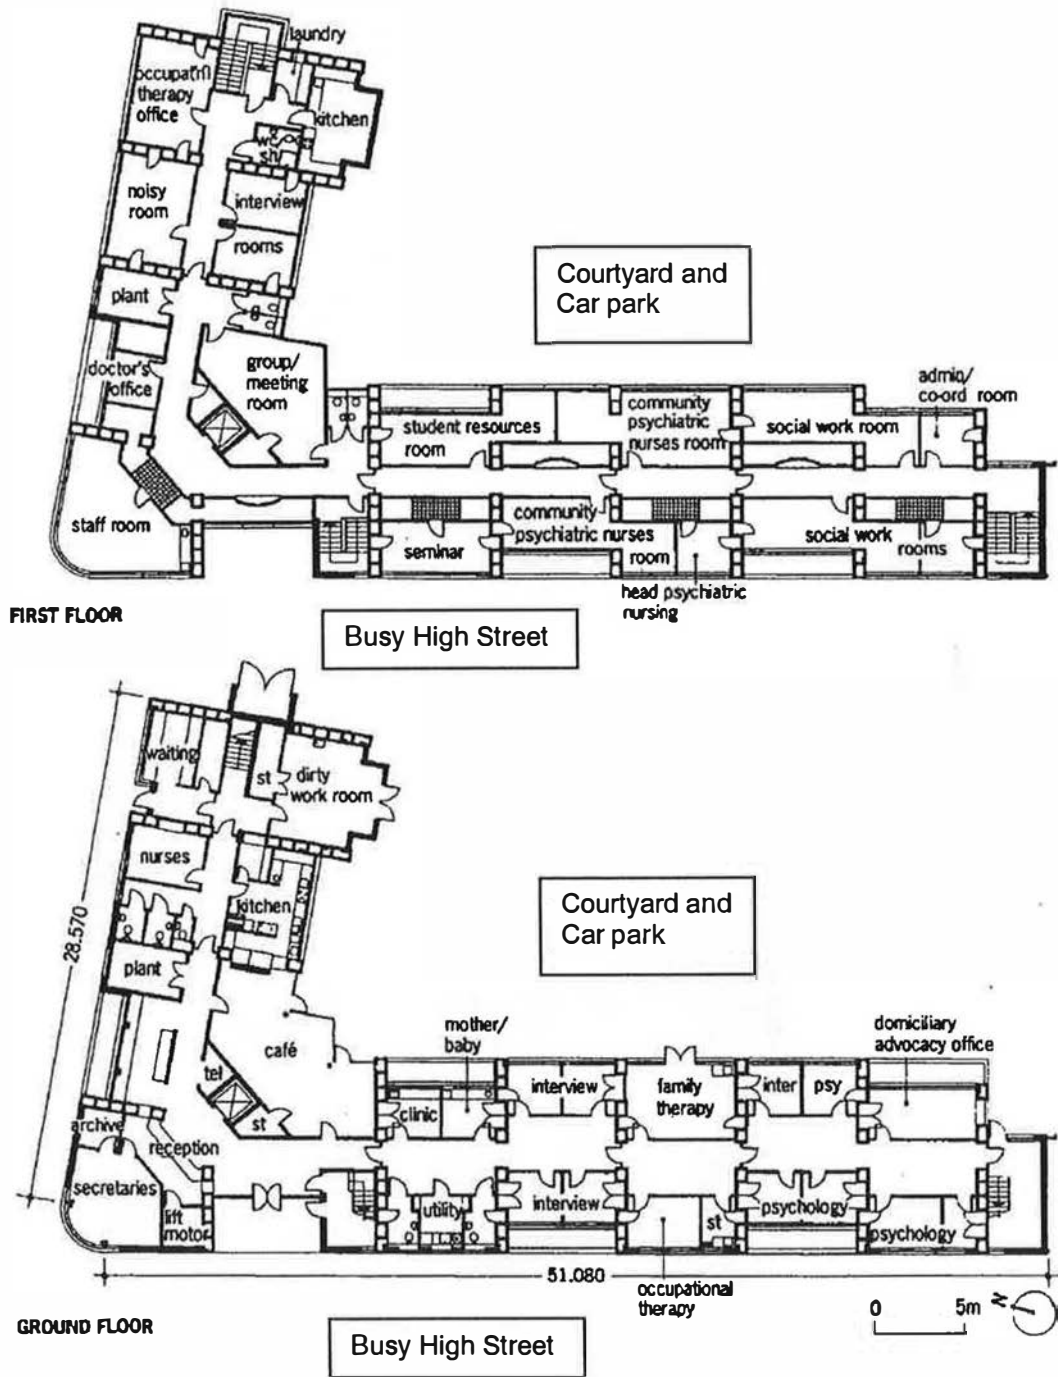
Plan view of the ground and first floors at the Canning Crescent Centre
